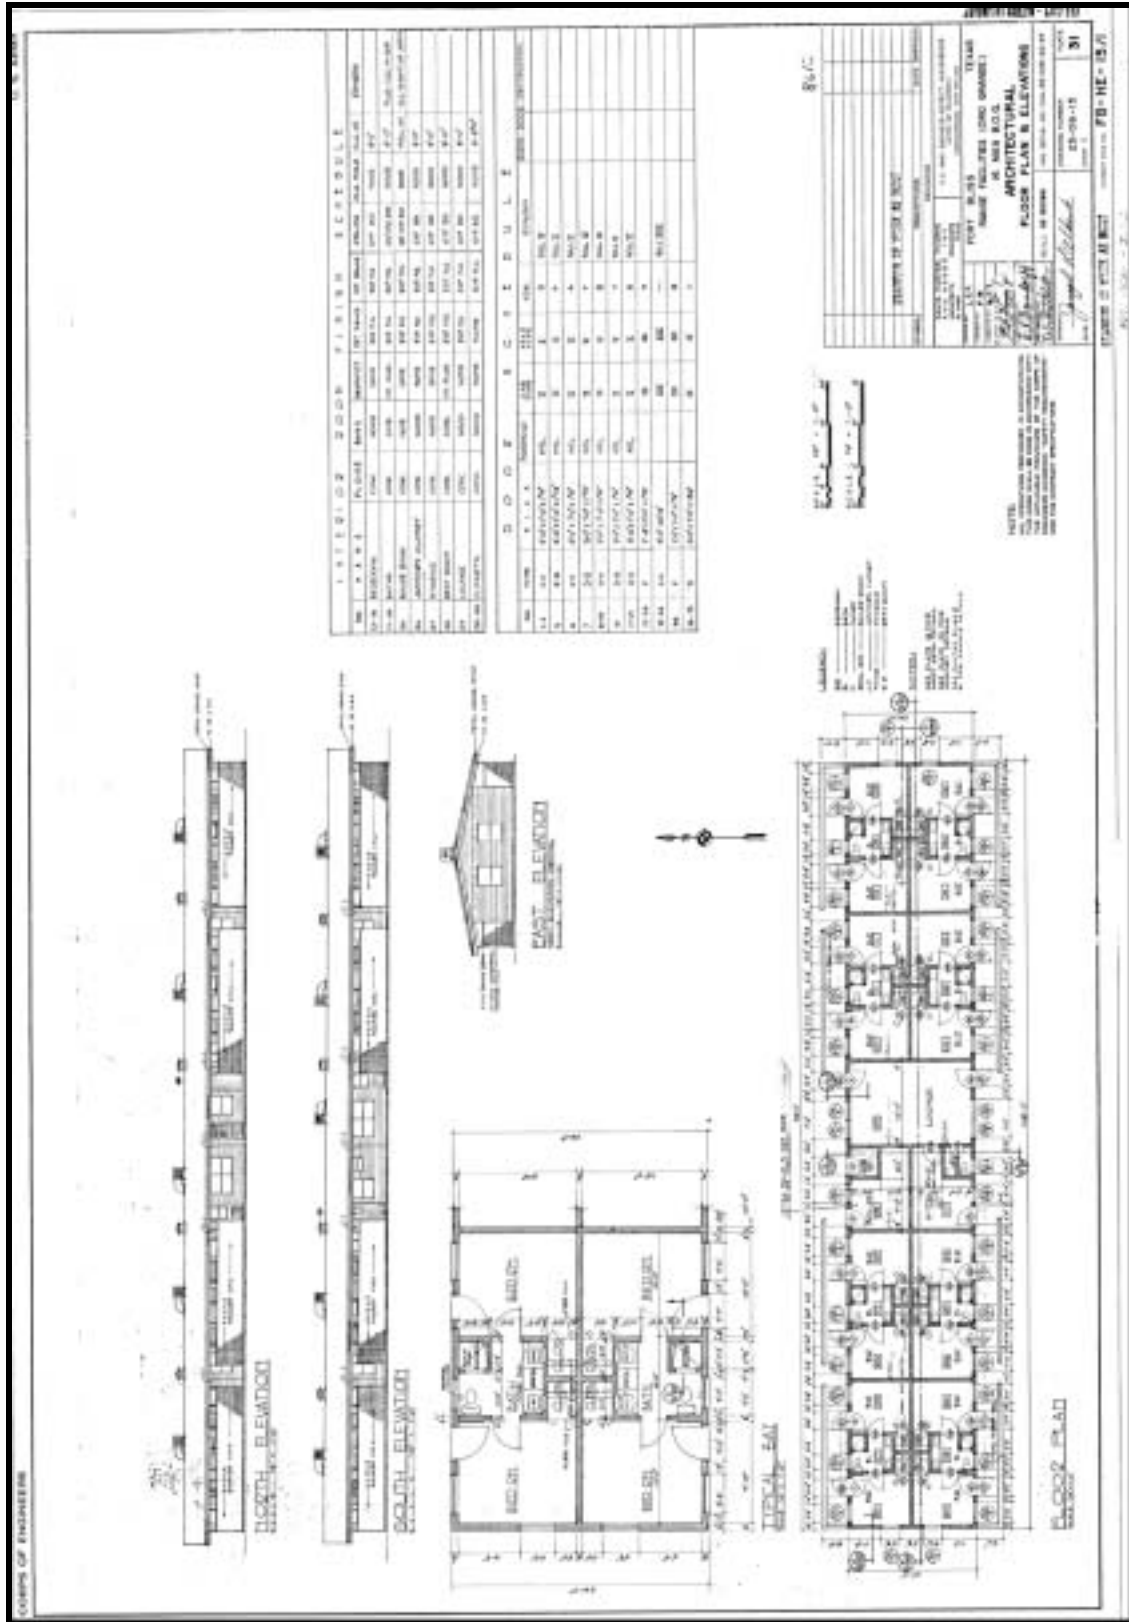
Semi-permanent 16-man BOQ, floor plan and elevations, Oro Grande Range, Ft. Bliss (ca. 1960) (Engineering, Ft. Bliss).
